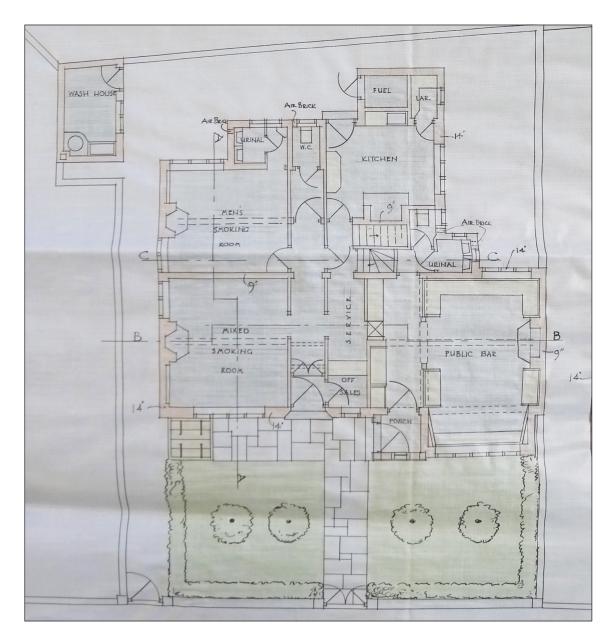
Ground-floor plan of the Spinners Arms, Cummersdale Road, Cummersdale, drawn in 1929 (CACC SRDB/3/PLANS/11-19 Reproduced under the Open Government Licence)
